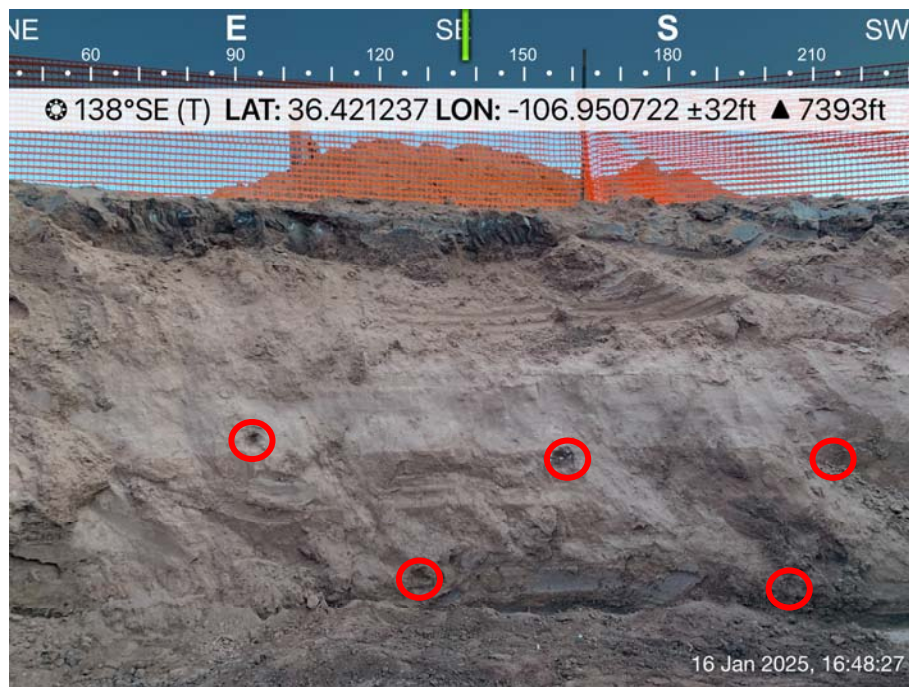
SS06 collected as a five-point composite sample 4-10 ft bgs from southeast sidewall of excavation.
